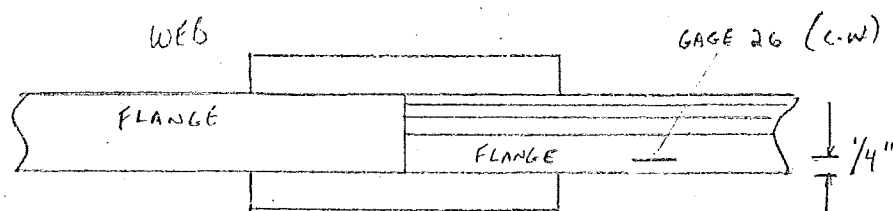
Gage at Columbia-Wrightsville Bridge
